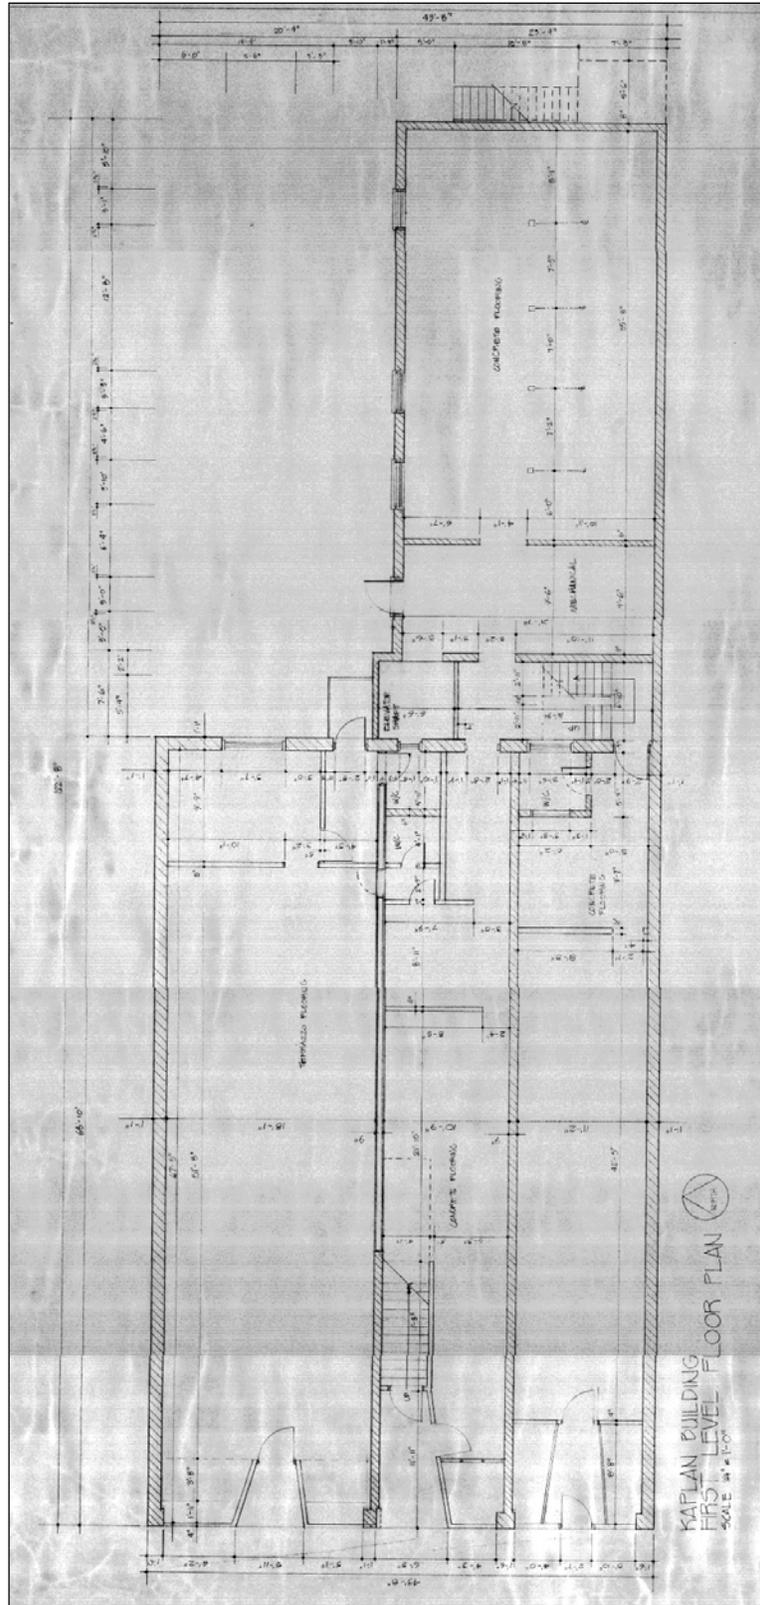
Architect’s plans, “First Level Floor Plan,” Plan No. 2971/1984. Note that the shop entrances are flush with the front wall. (City of Winnipeg.)
